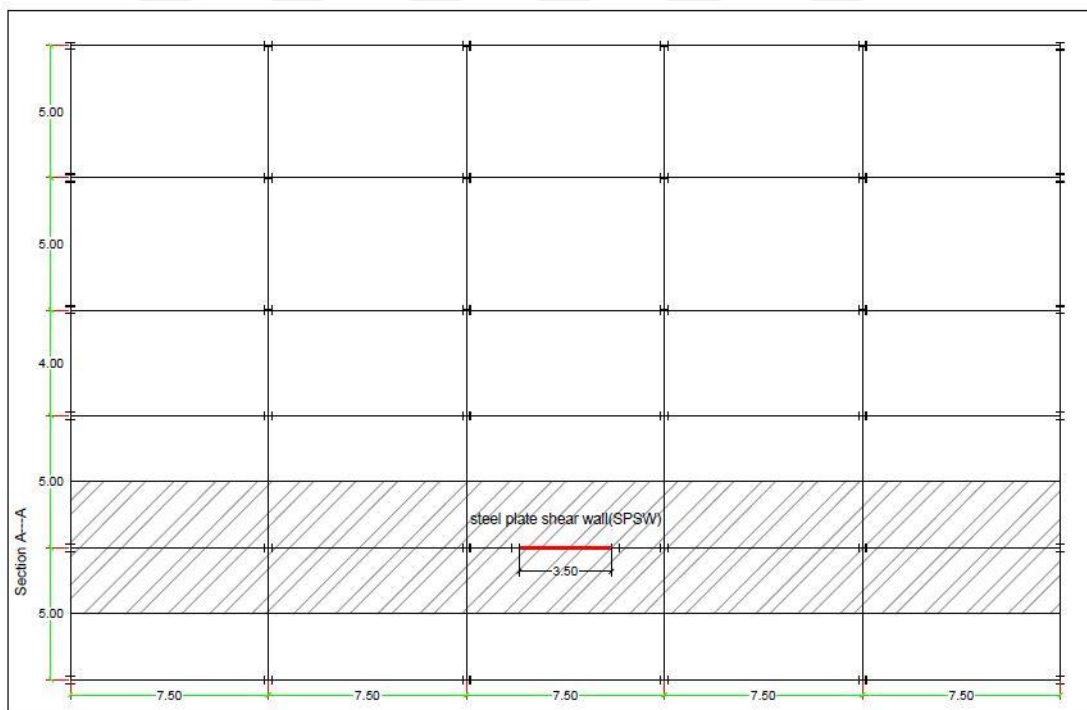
Plan of 4-story building with steel plate shear walls having aspect ratio of 1.000 (Model 3)
